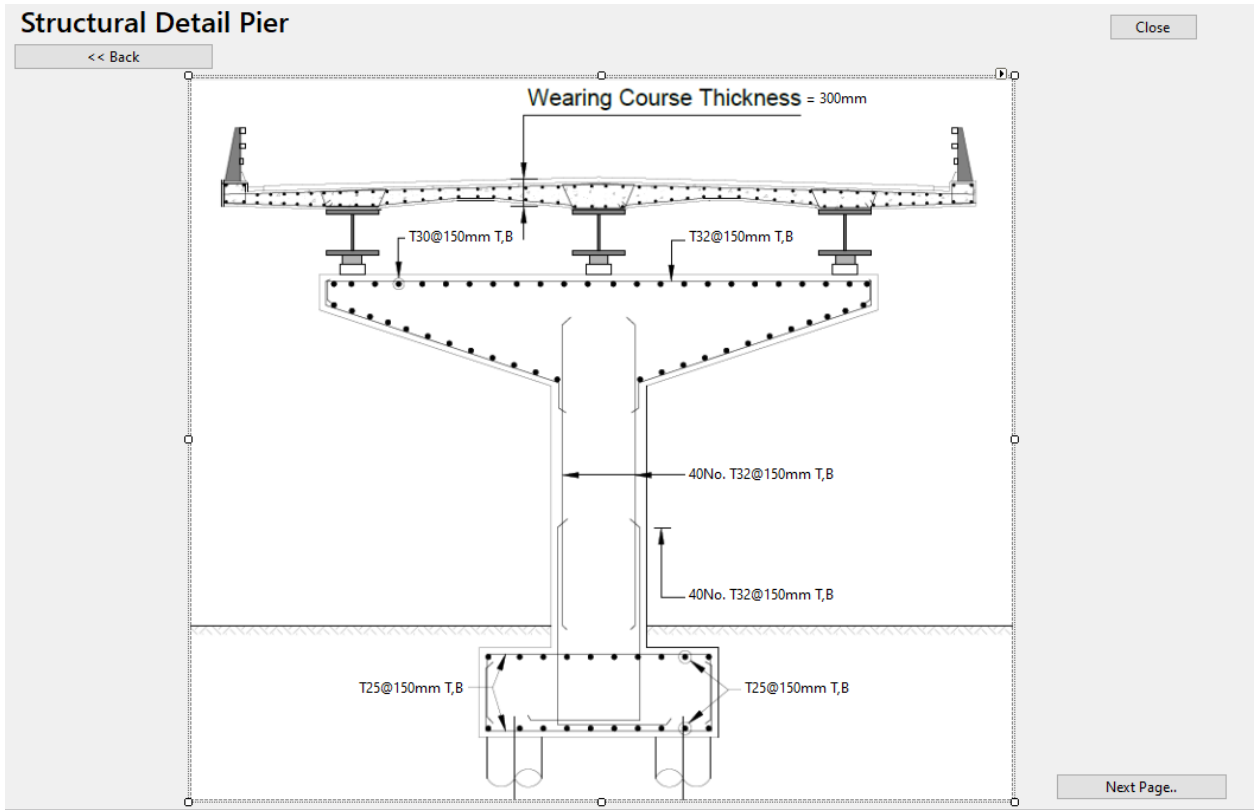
Form VI- Structural Detail of Pier and Footing
